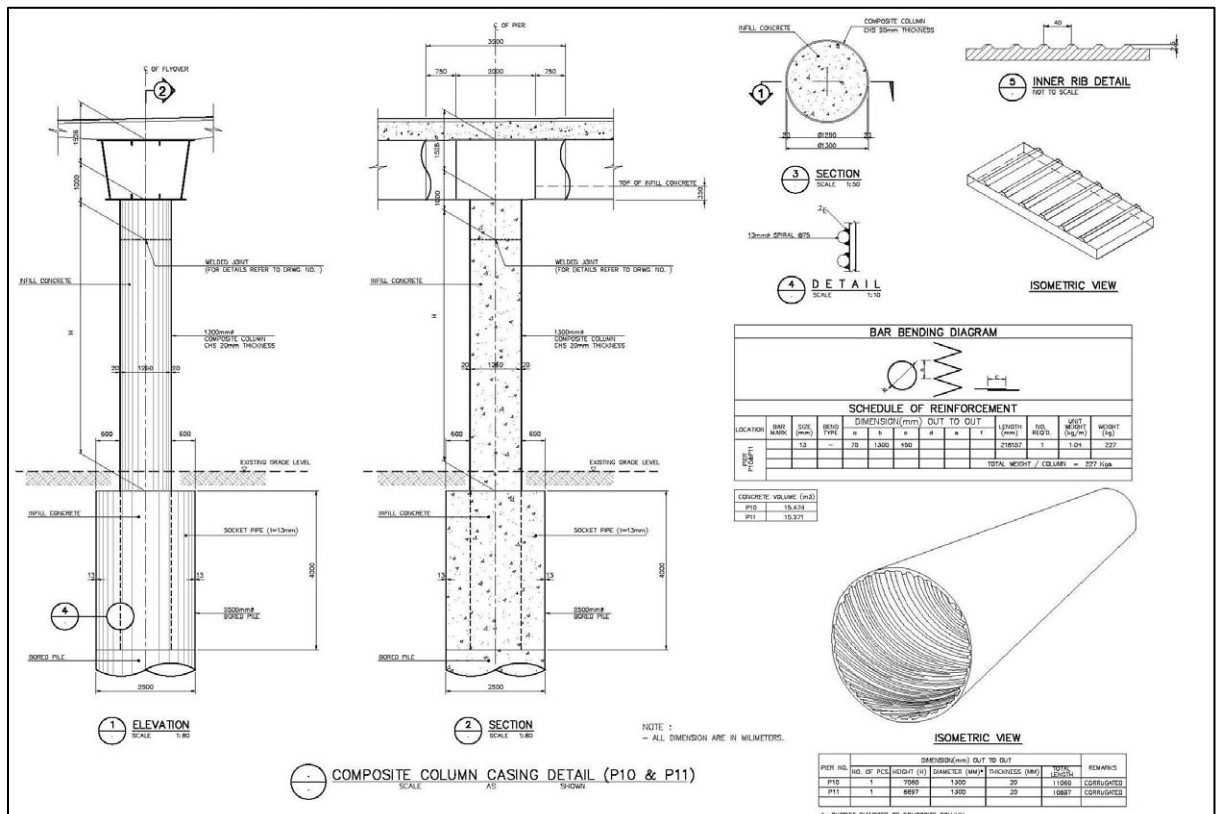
TYPICAL ONE COLUMN PIER
